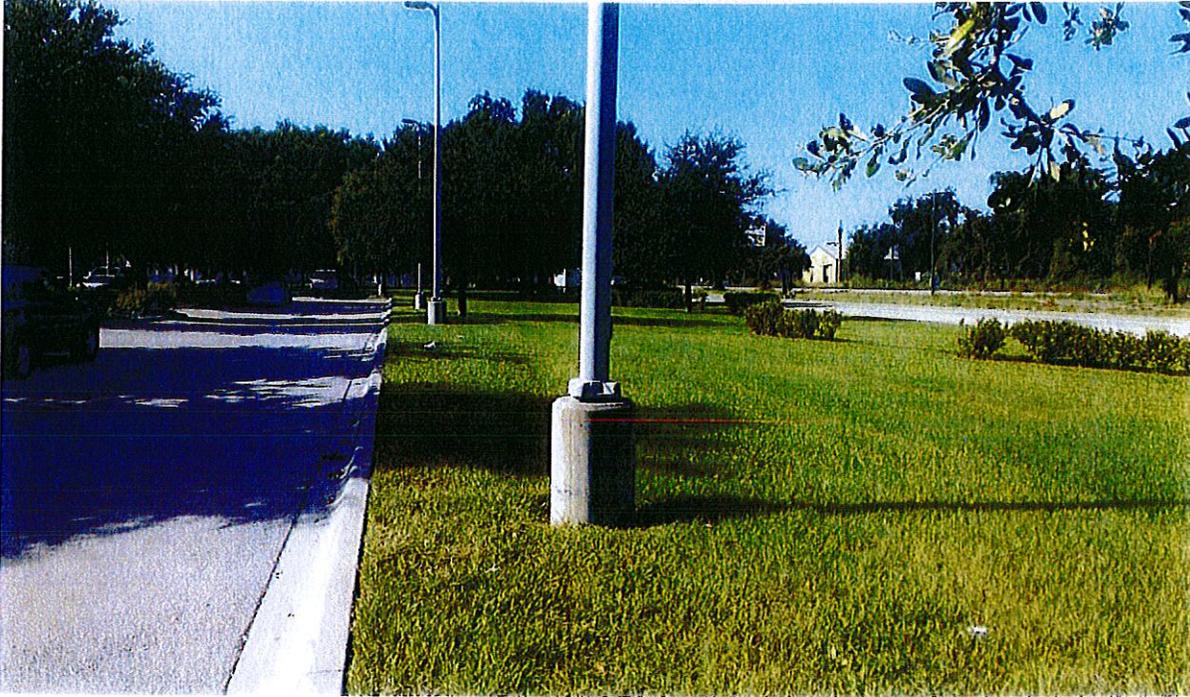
Light Poles in Conflict with Proposed Parking Addition
